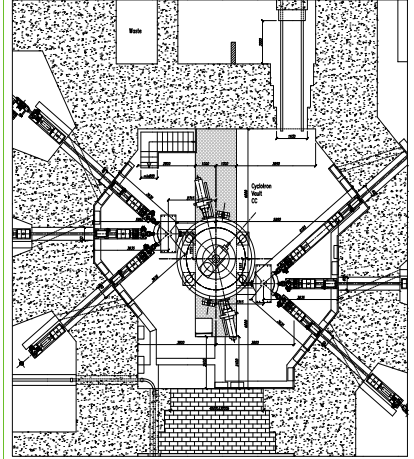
Cyclone® 70 vault dimensions and equipment entry clearance
